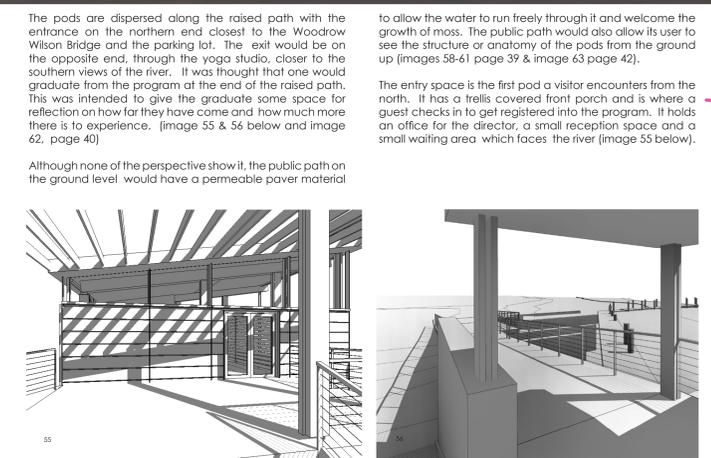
view of entrance, looking south. Image 56 - end of the public path outside the yoga pod, facing south towards the river.
